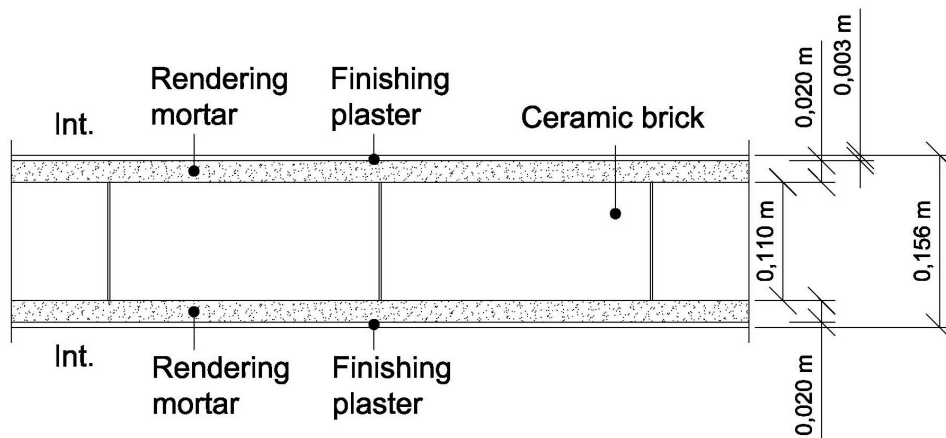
Horizontal cross section of wall W1: ceramic hollow brick.
